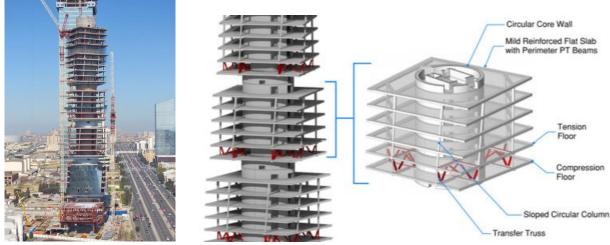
(a) MOT Tower – Baku, Azerbaijan, (b) MOT Tower Lateral System [2]
